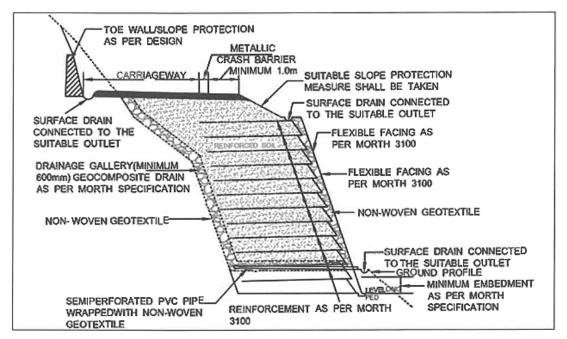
Cross-section of Reinforced Soil Slope with Flexible Facing
